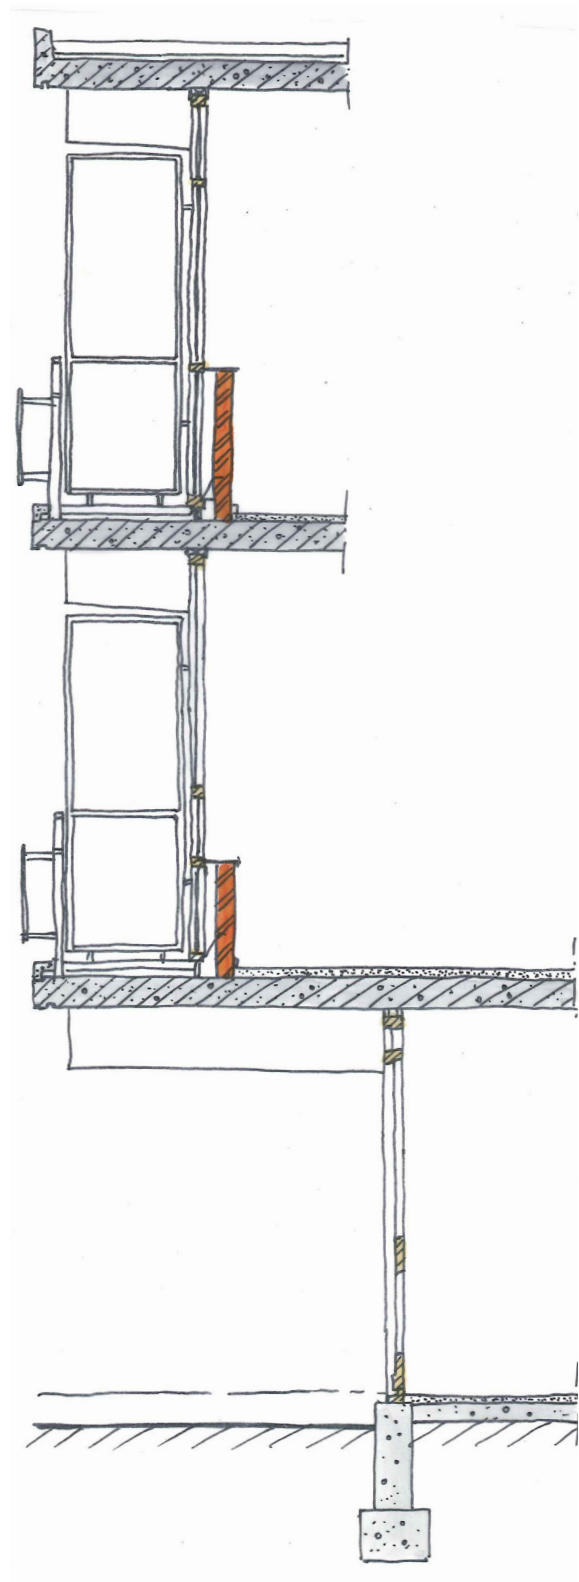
Section of the south façade of the terraced houses in Vrieheide (own ill.).
